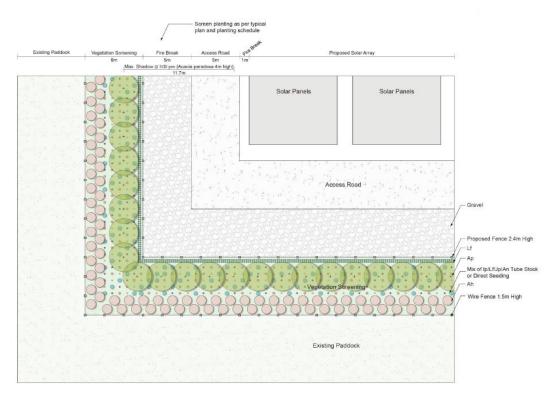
Schedule and Planting configuration of proposed Landscaping (Source: Advertised plans)
